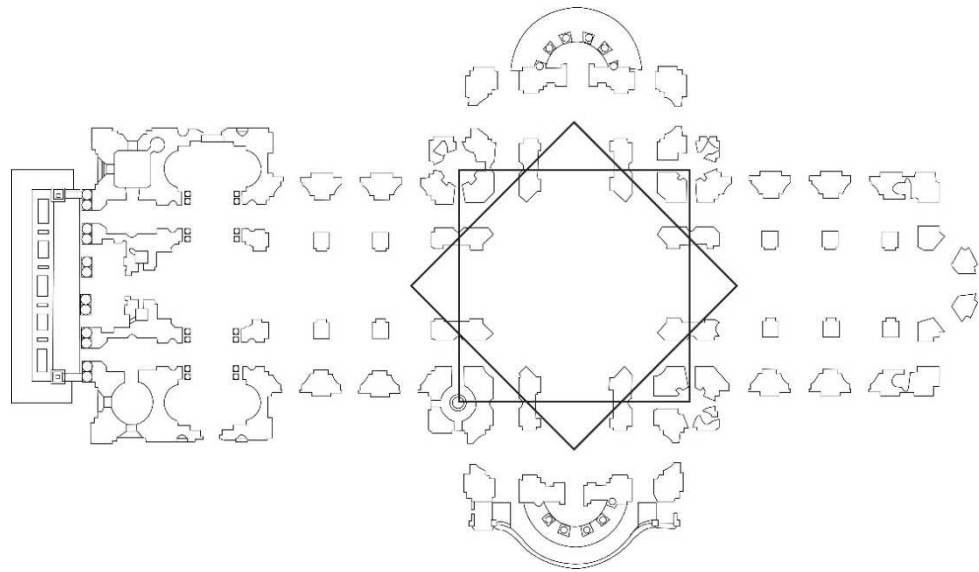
6 The floor plan of St. Paul's Cathedral (location: London UK, years built: 1675-1720)
